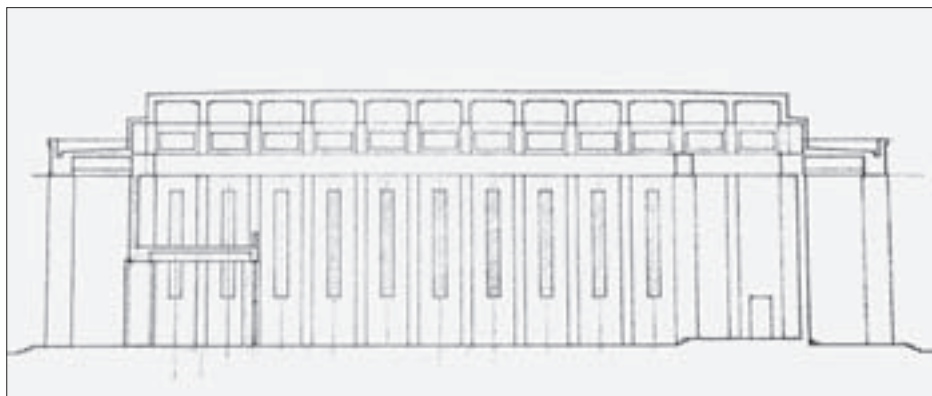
I. MESTROVIC: CHURCH OF CHRIST THE KING, TRNJE, PLAN, 1922
